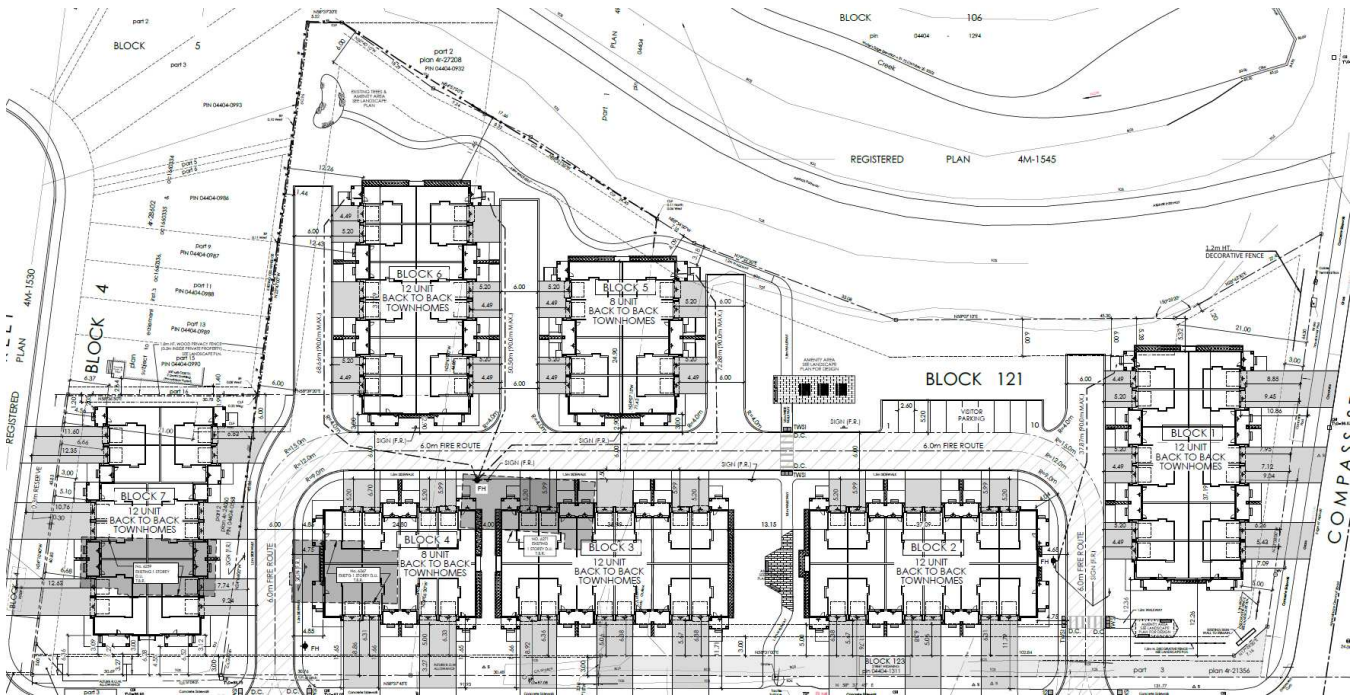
Excerpt from proposed site plan (prepared by M. David Blakely, June 2025)
